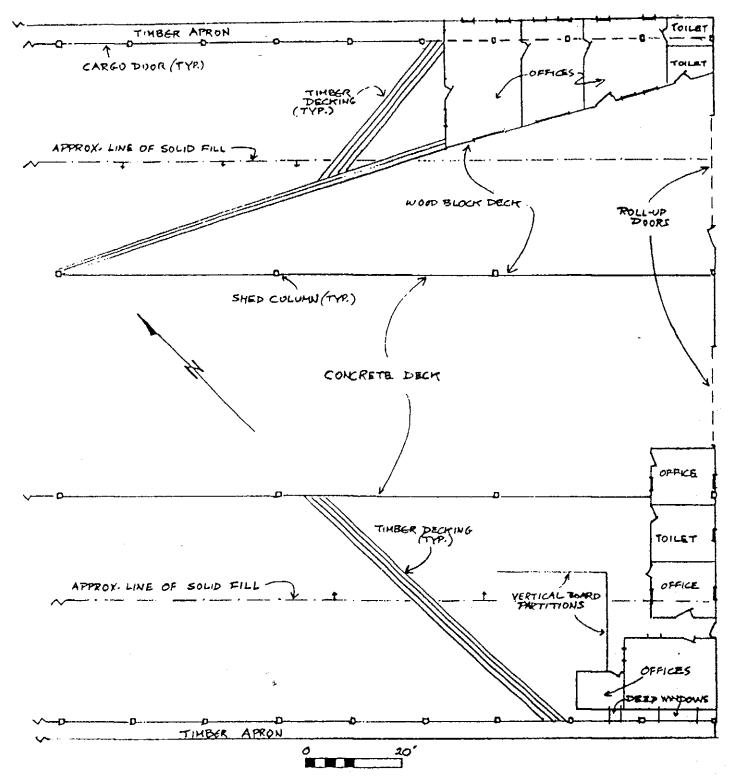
PLAN OF INSHORE END OF PIER 7, 1988
